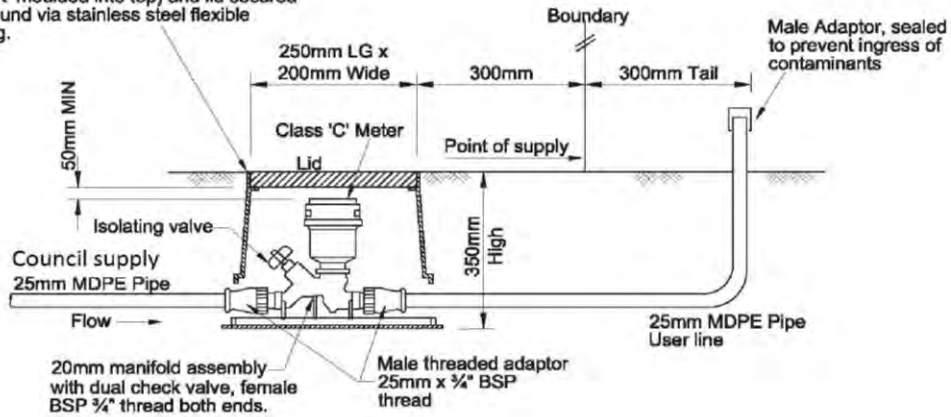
TS 627 Standard connection installation 20-50mm pipework
